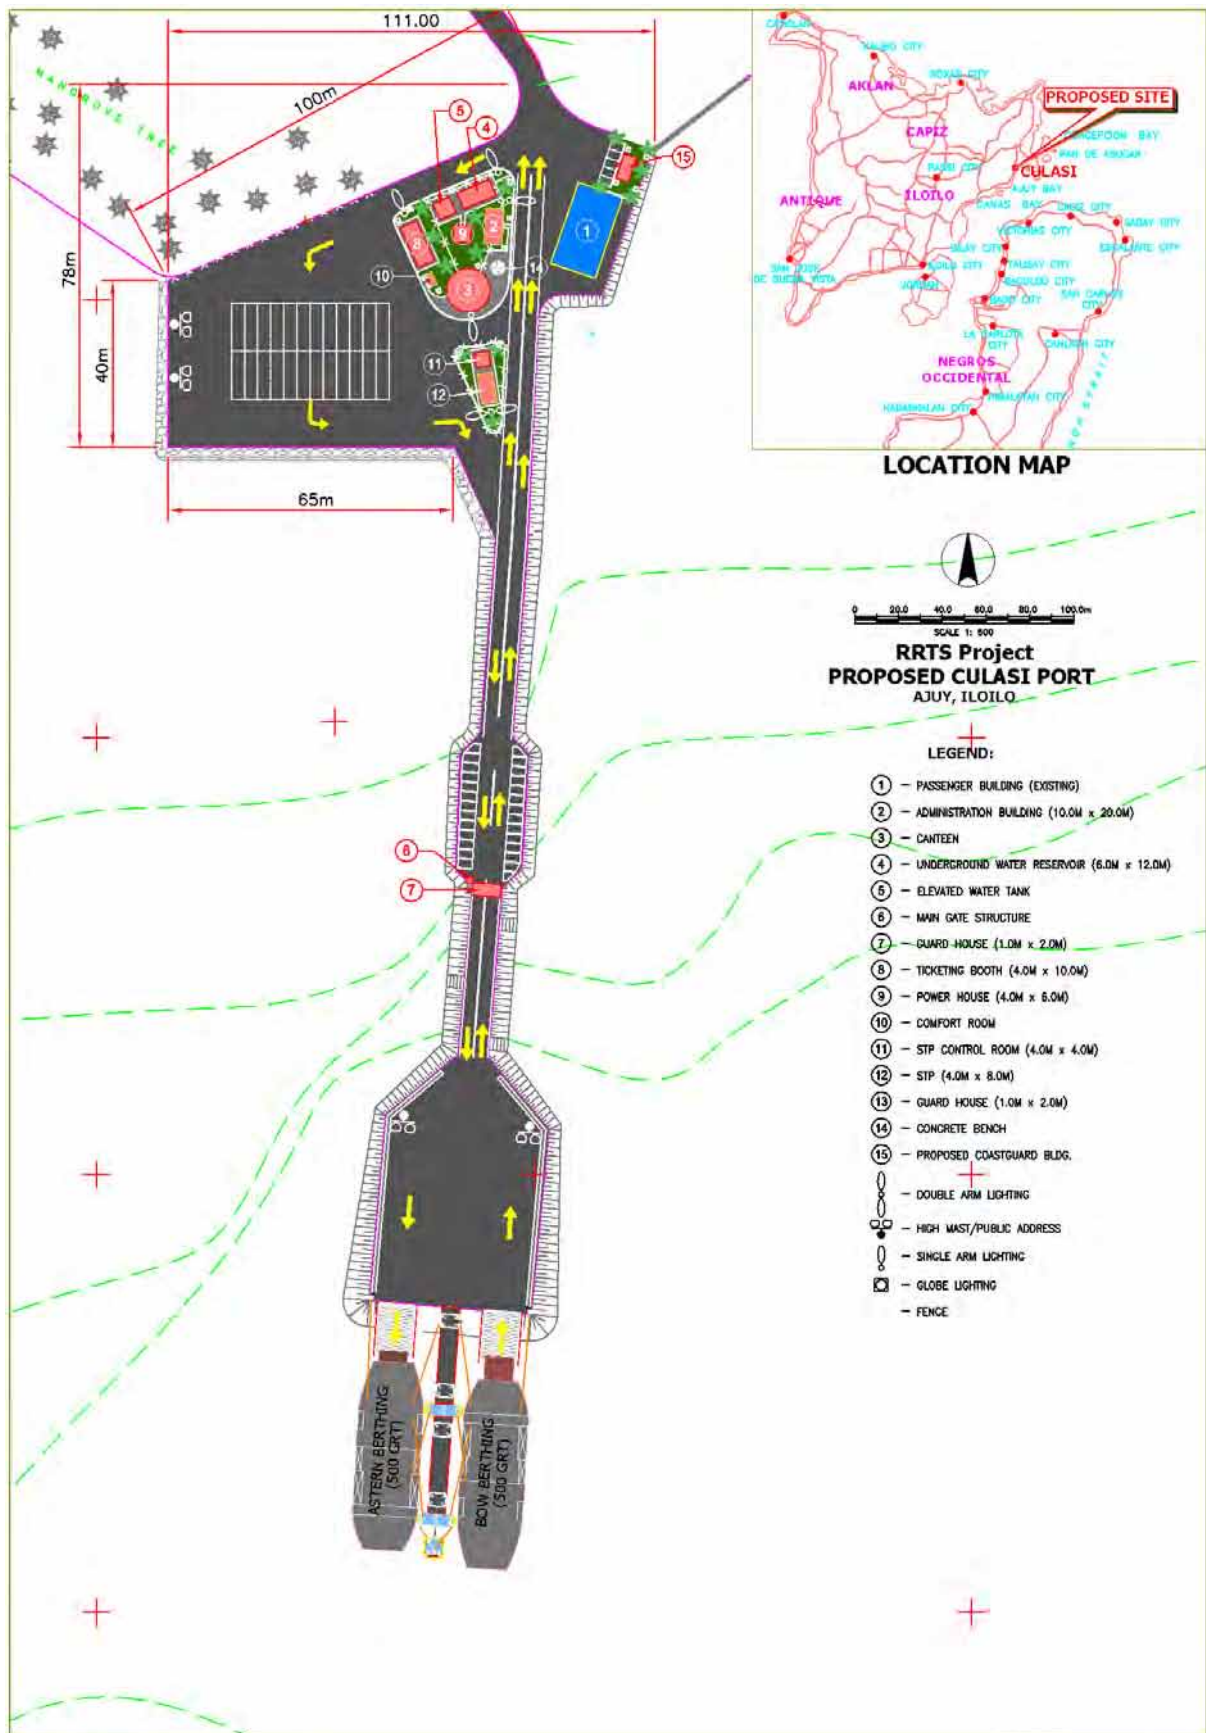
Culasi/Ajuy Port Terminal Payout Plan
